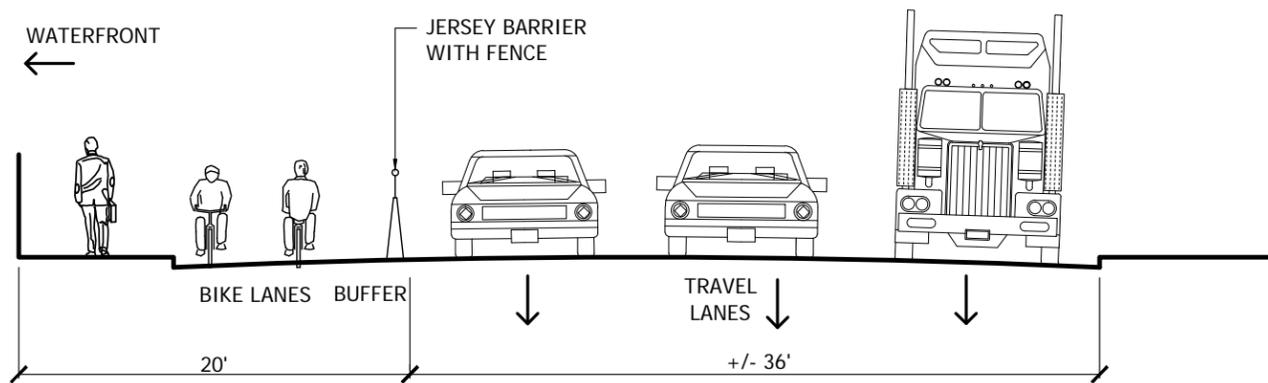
Possible Short-Term Configuration for Hamilton Avenue from Hamilton Avenue Bridge to 21st Street
